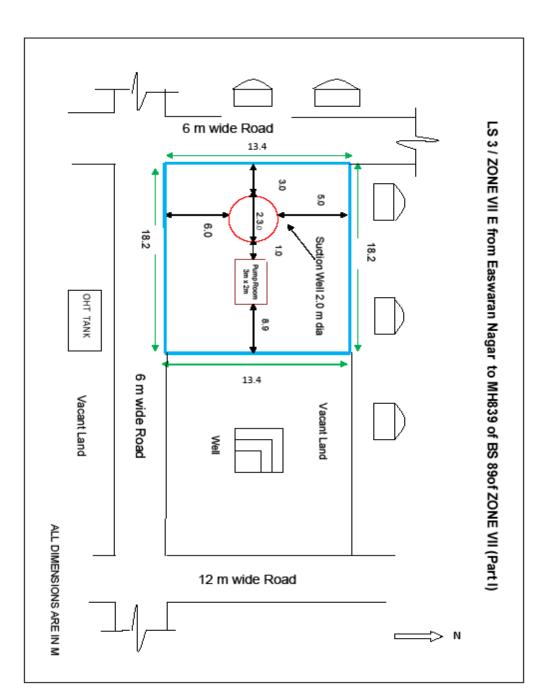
Site Set out Plans – Zone VII (Easwaran Nagar)
